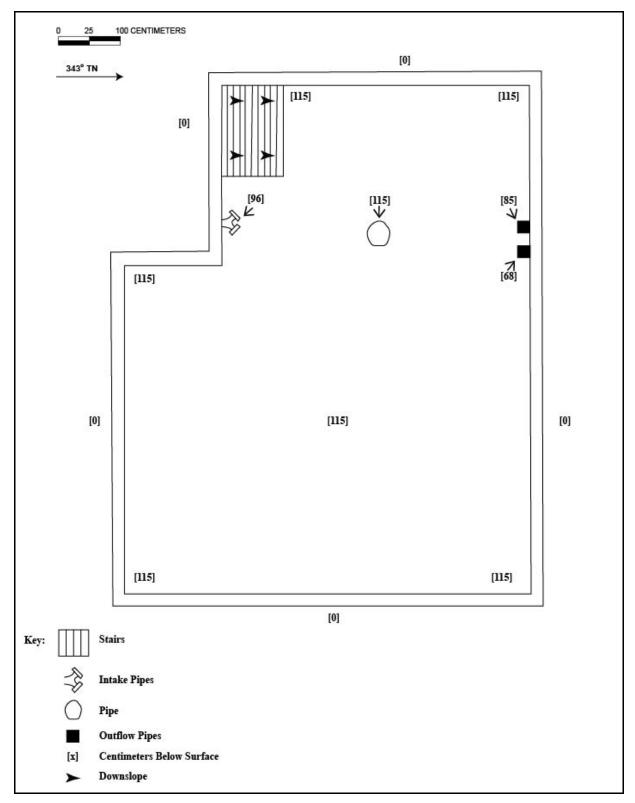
Plan view of SIHP # -4042, historic Waimānalo Irrigation System pump house foundation
